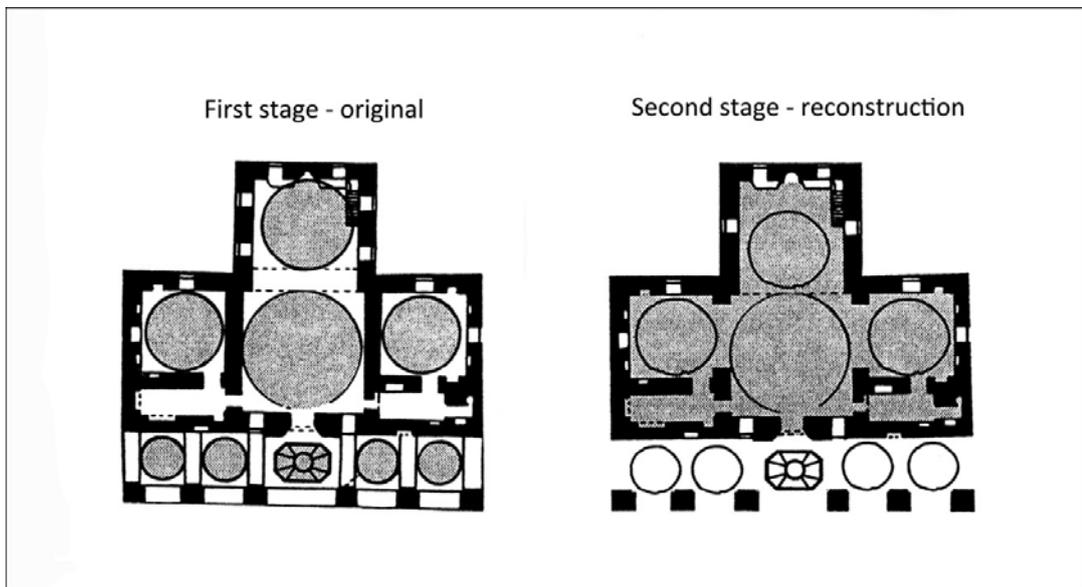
Floor plan of Şihabeddin Paşa's *imaret/zaviye* showing the original shape of the building & the reconstruction, which opened the *tabhanes* to the main space (plan M. Harbova)
